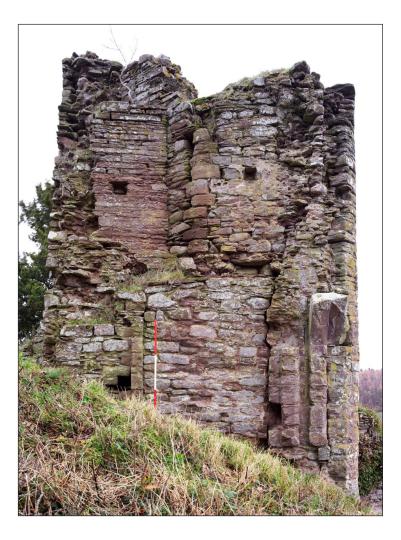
Southwest corner of the tower, interior, showing the survivng western opening at first-floor level (DP195367).
